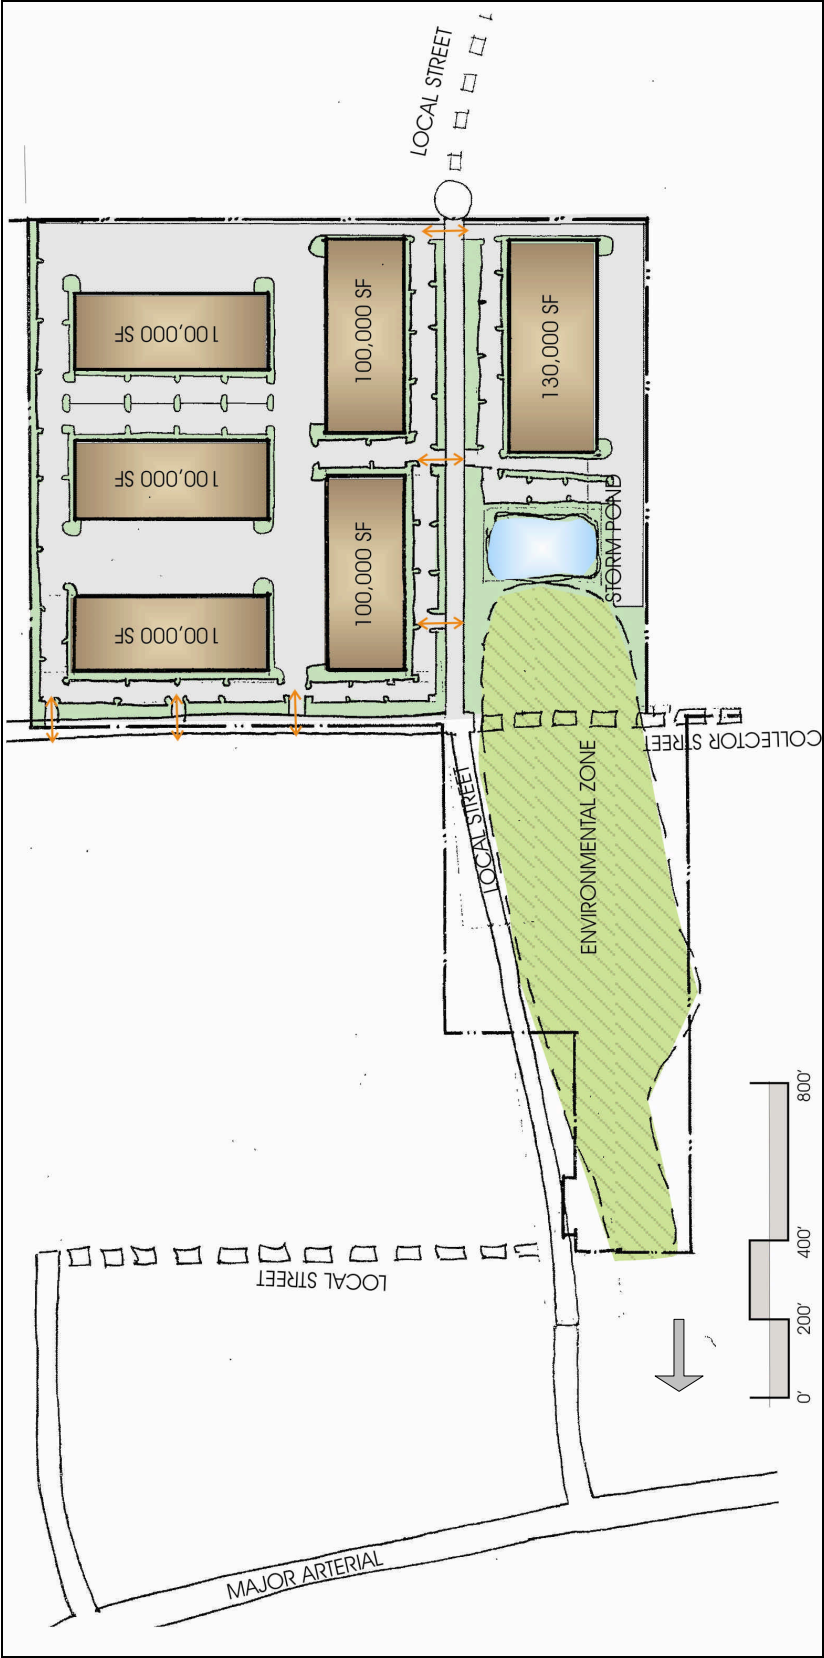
Industrial Park Greenfield Conceptual Site Plan
